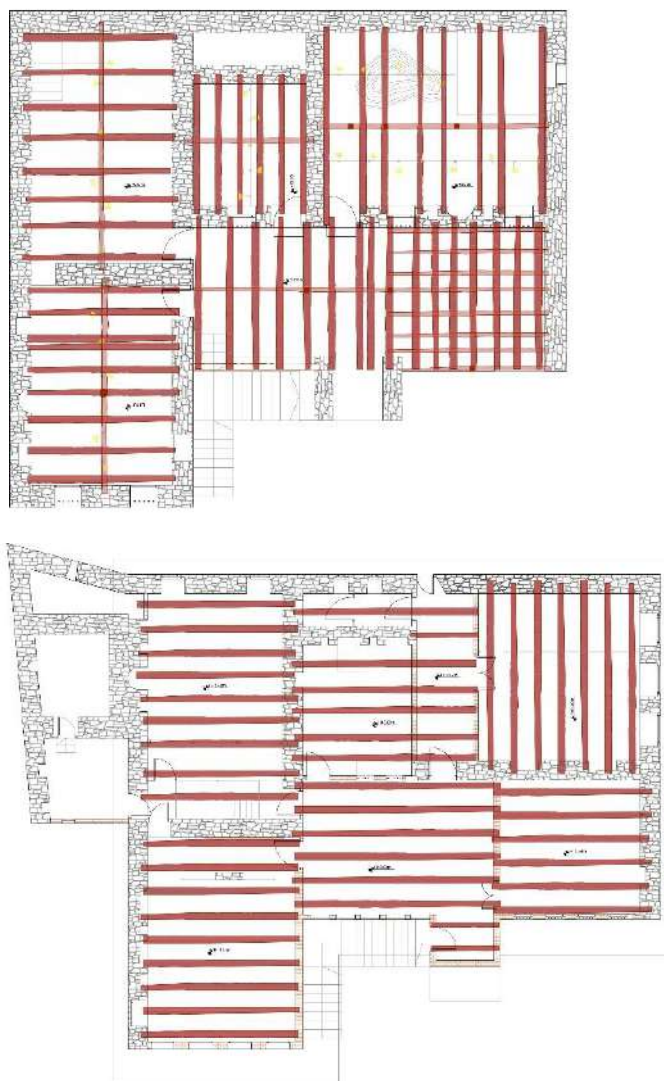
Beams' Plan, Proposal (up: ground floor plan; down: first floor plan)
